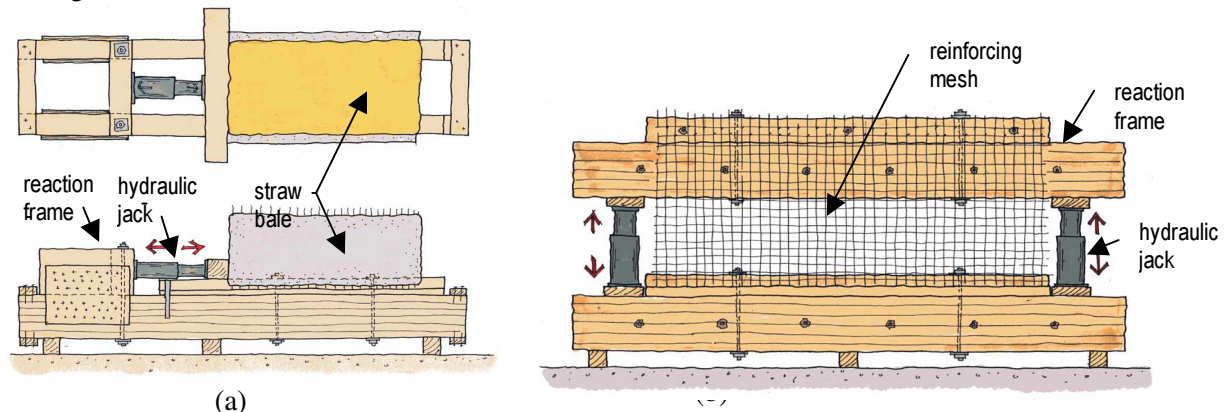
(a) Shear anchorage test setup, and (b) tension anchorage test setup.
